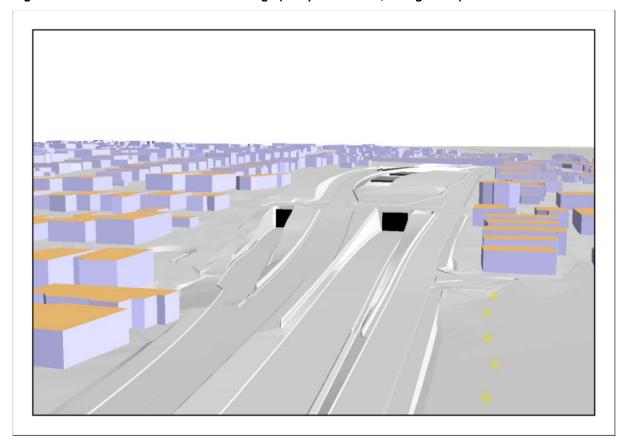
Reconfigured Wattle Street interchange (oblique elevation, facing south)
